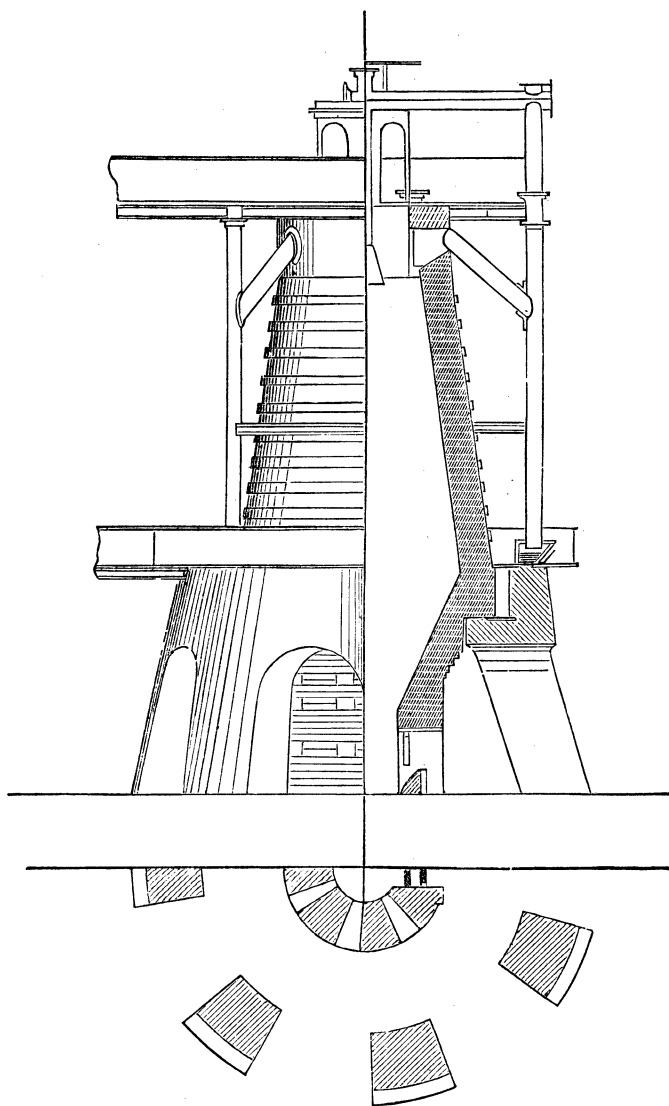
Buttgenbach's blast-furnace.—Elevation and section.
